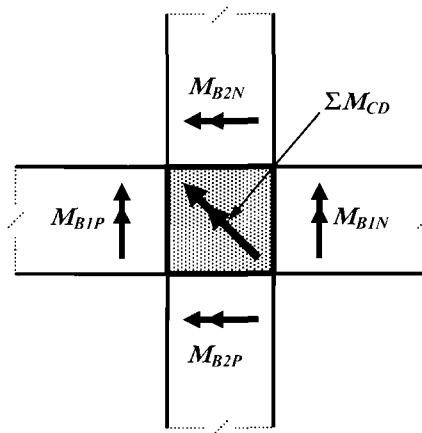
Plan View of Moment Input to Interior Column of a Two-way Frame
